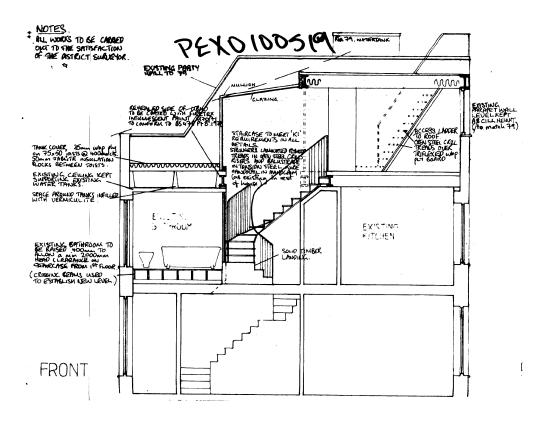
Approved section of 77 Bartholomew Road - Application PEX0100519
